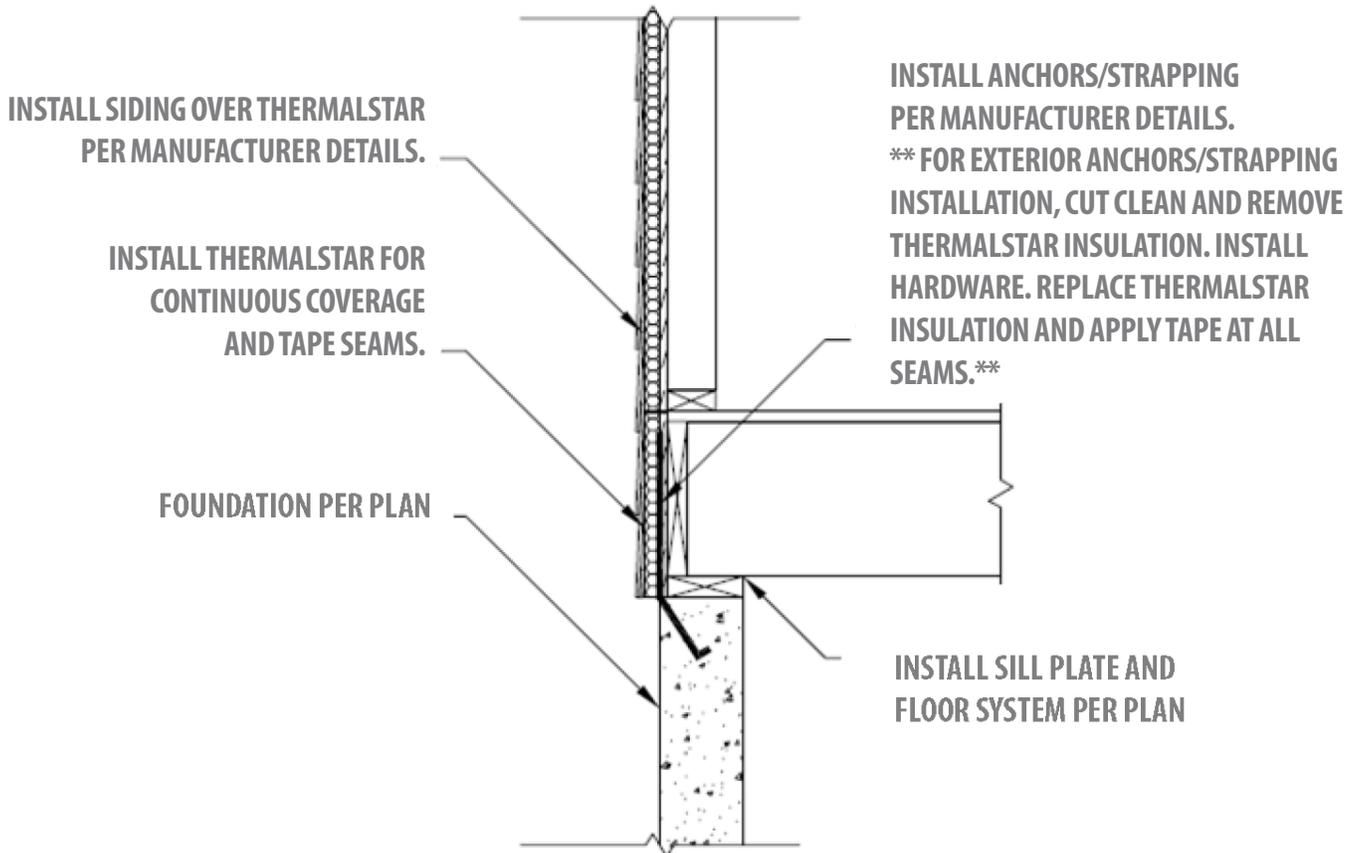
TYPICAL WALL SECTION AT FLOOR DECK WITH SIDING
